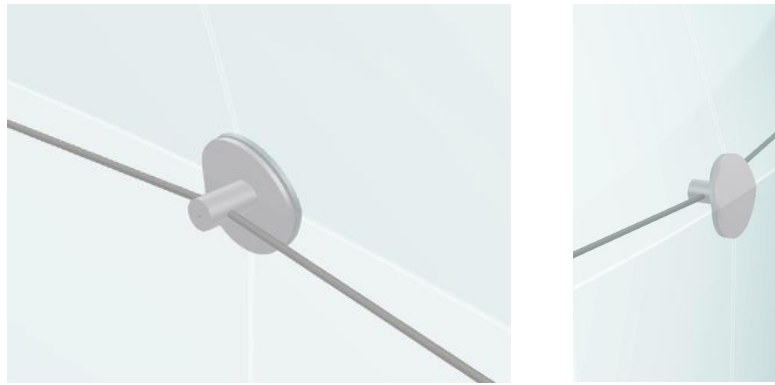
& 61: 3d detail connection between dome and base (own figures)
